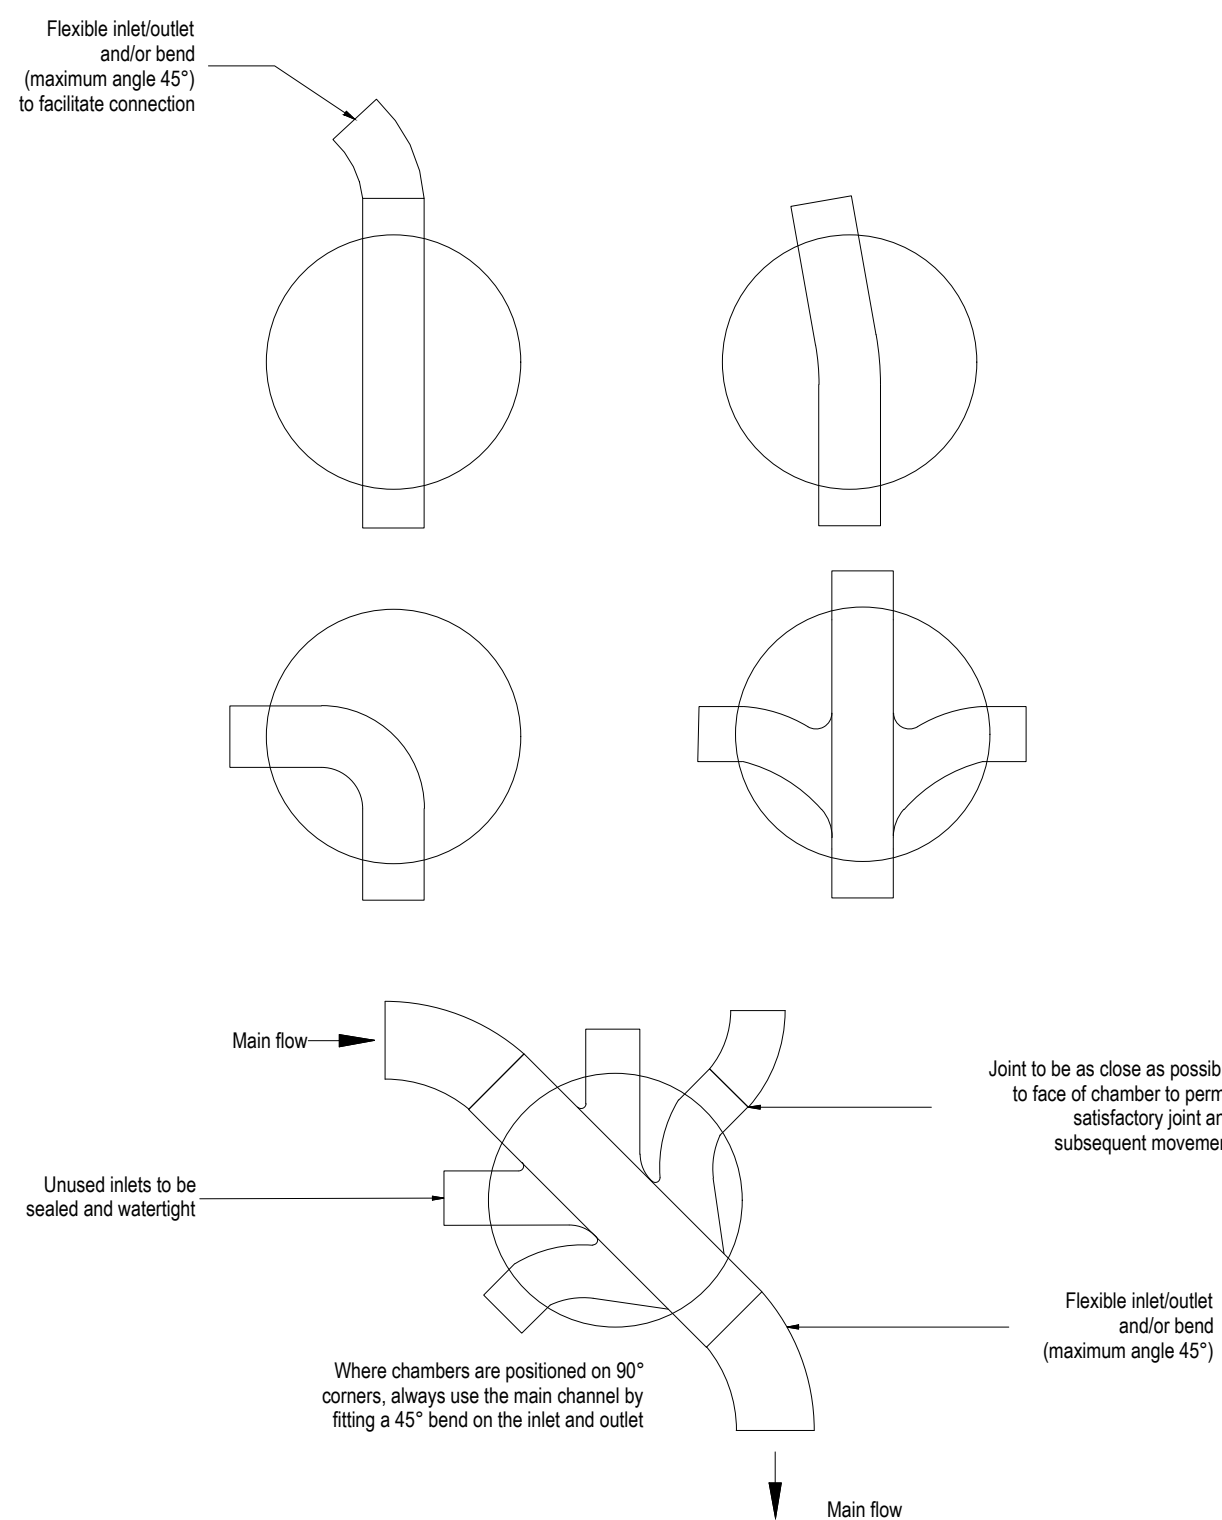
TYPICAL BASE LAYOUTS FOR TYPE D CHAMBERS
